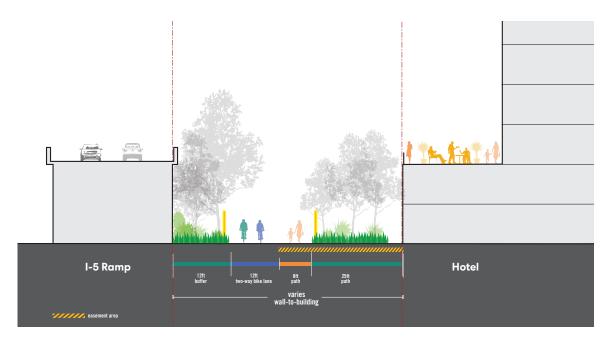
Section between the I-5 North-bound Ramp and New Hotel Development
